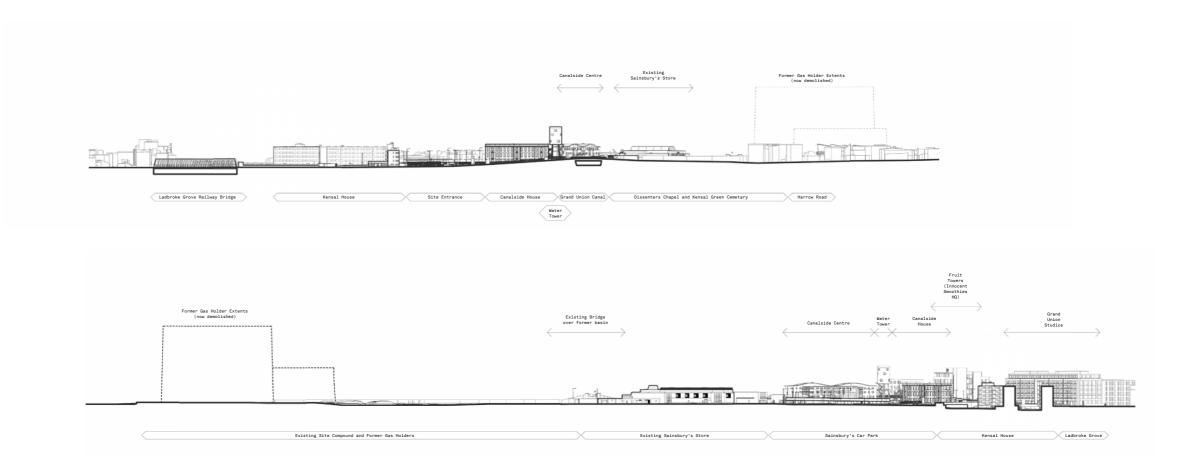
Site sections showing the scale of the former gas holders in the context of existing buildings on site
